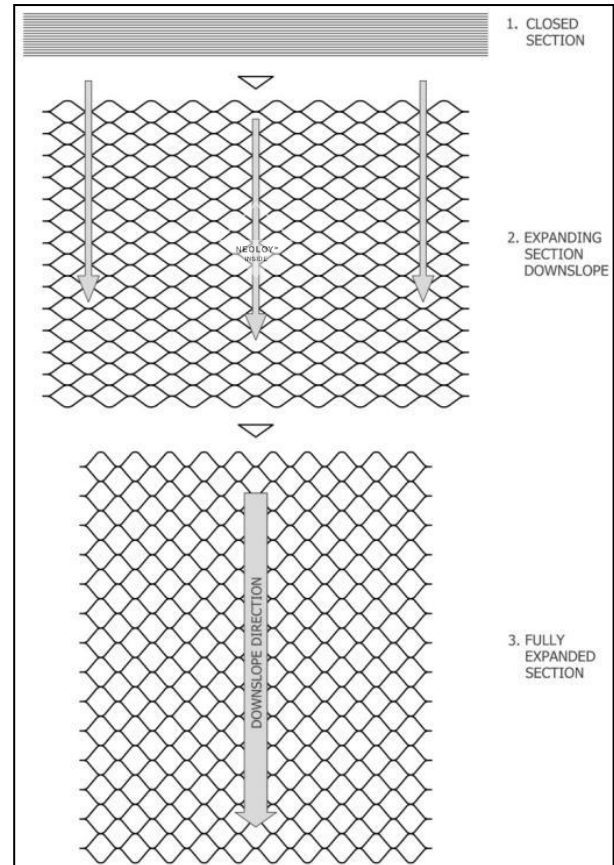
PLAN VIEW - LAYOUT & DIRECTION OF SECTIONS & CELLS
